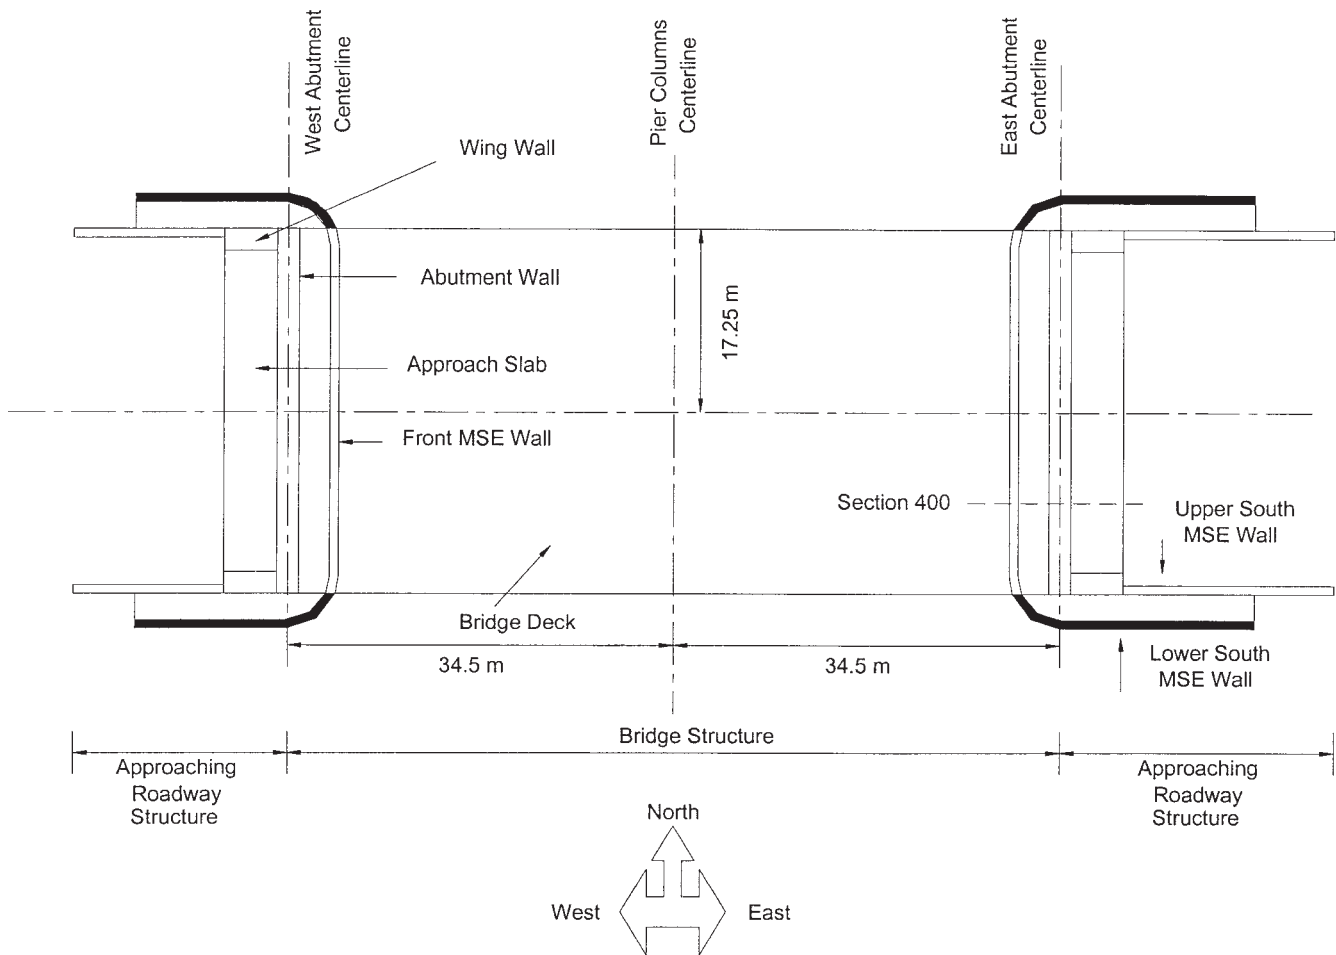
Plan view of the Founders/Meadows bridge-supporting structure (Abu-Hejleh et al., 2000).
